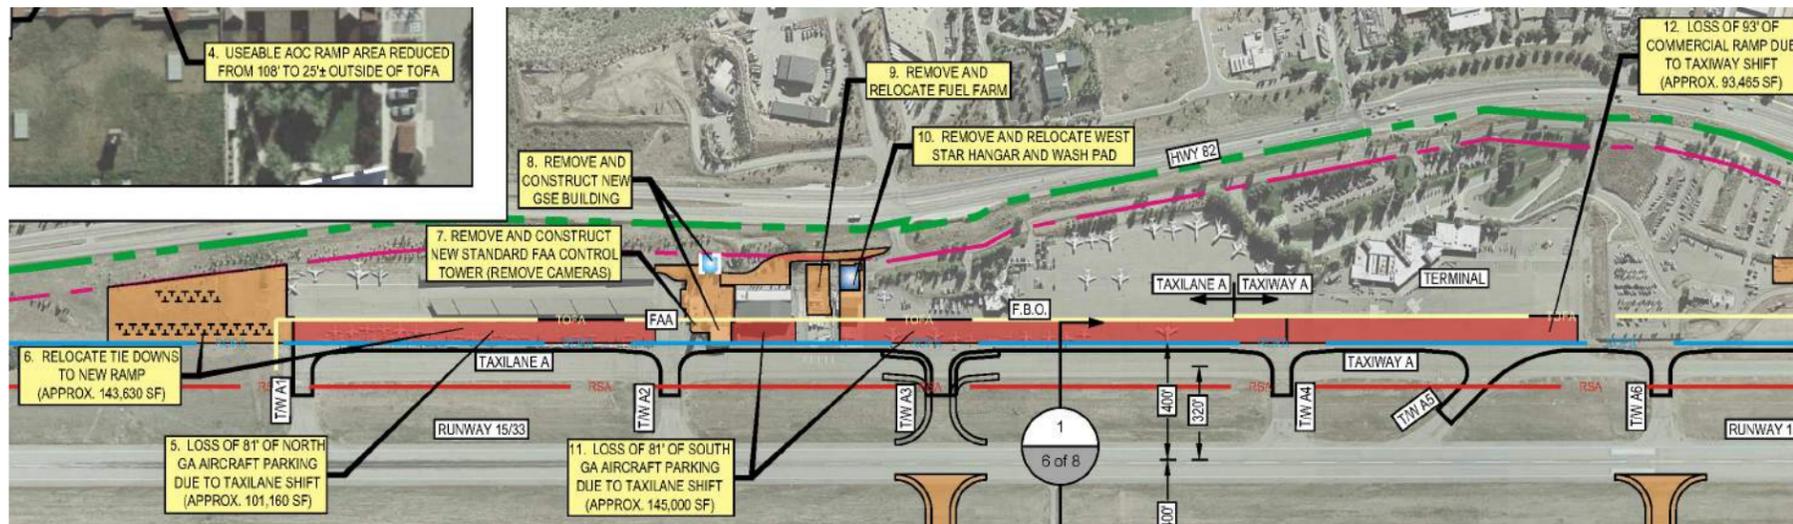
Impacts to Master Plan Commercial and South GA Ramps (Appendix C, Alternative 6, Sheet 3 of 7)
